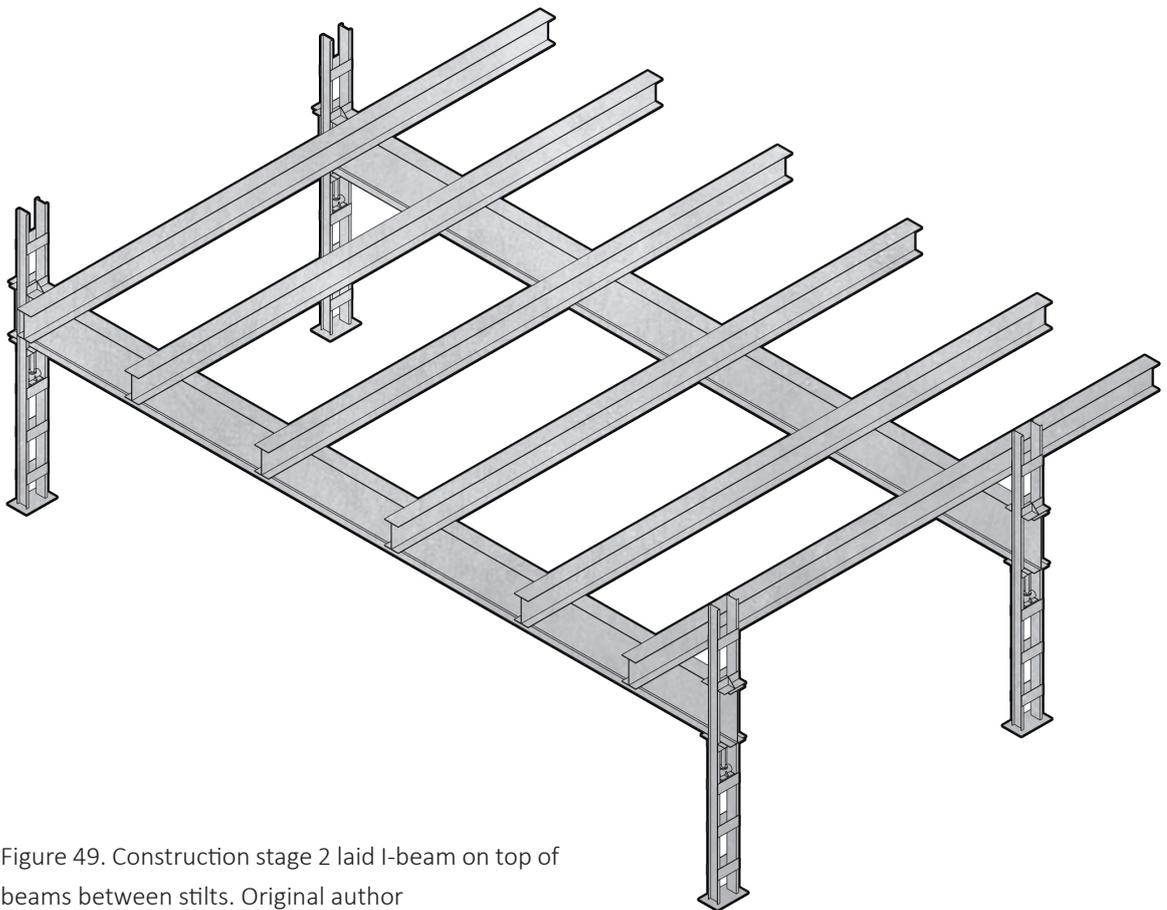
Construction stage 2 laid I-beam on top of beams between stilts. Original author
